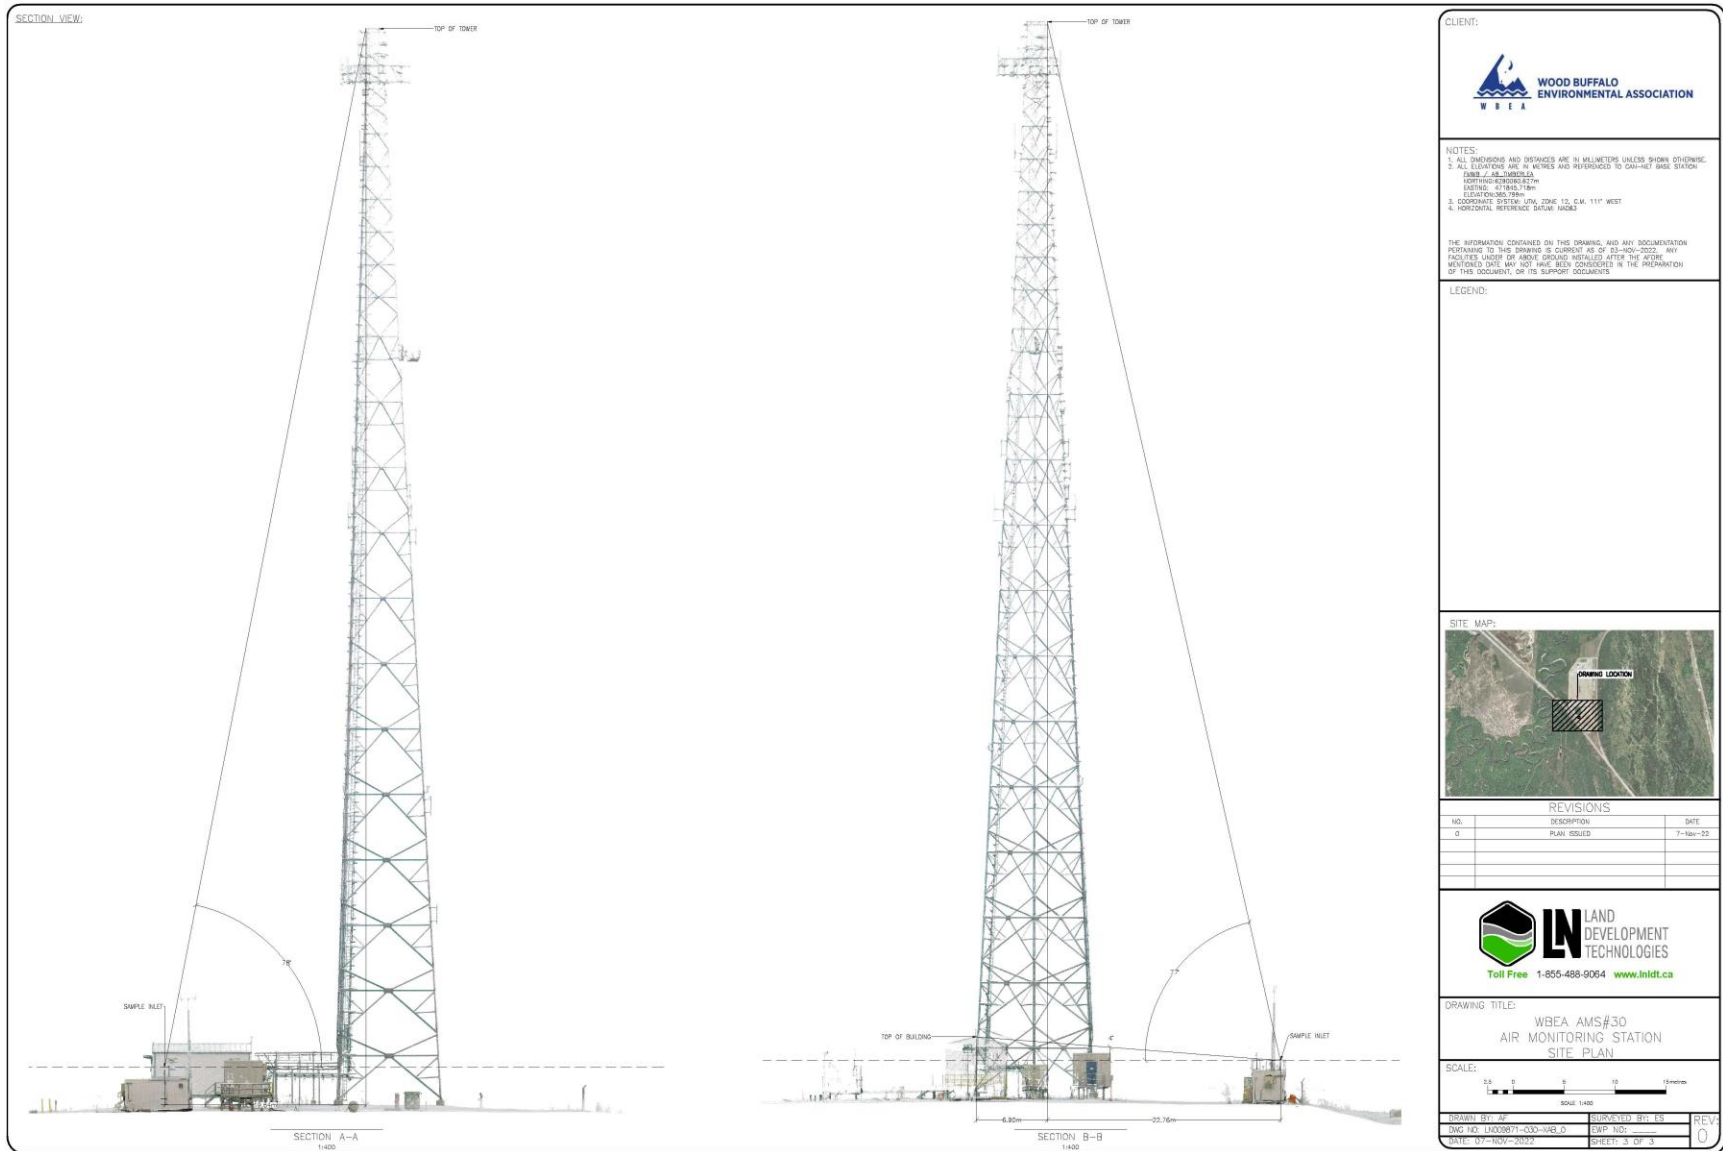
Cross-Sectional Elevation Drawing of AMS 30
